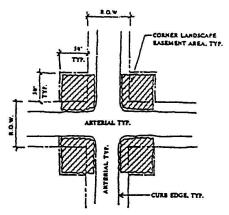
ENTRIES LOCATION PLAN
